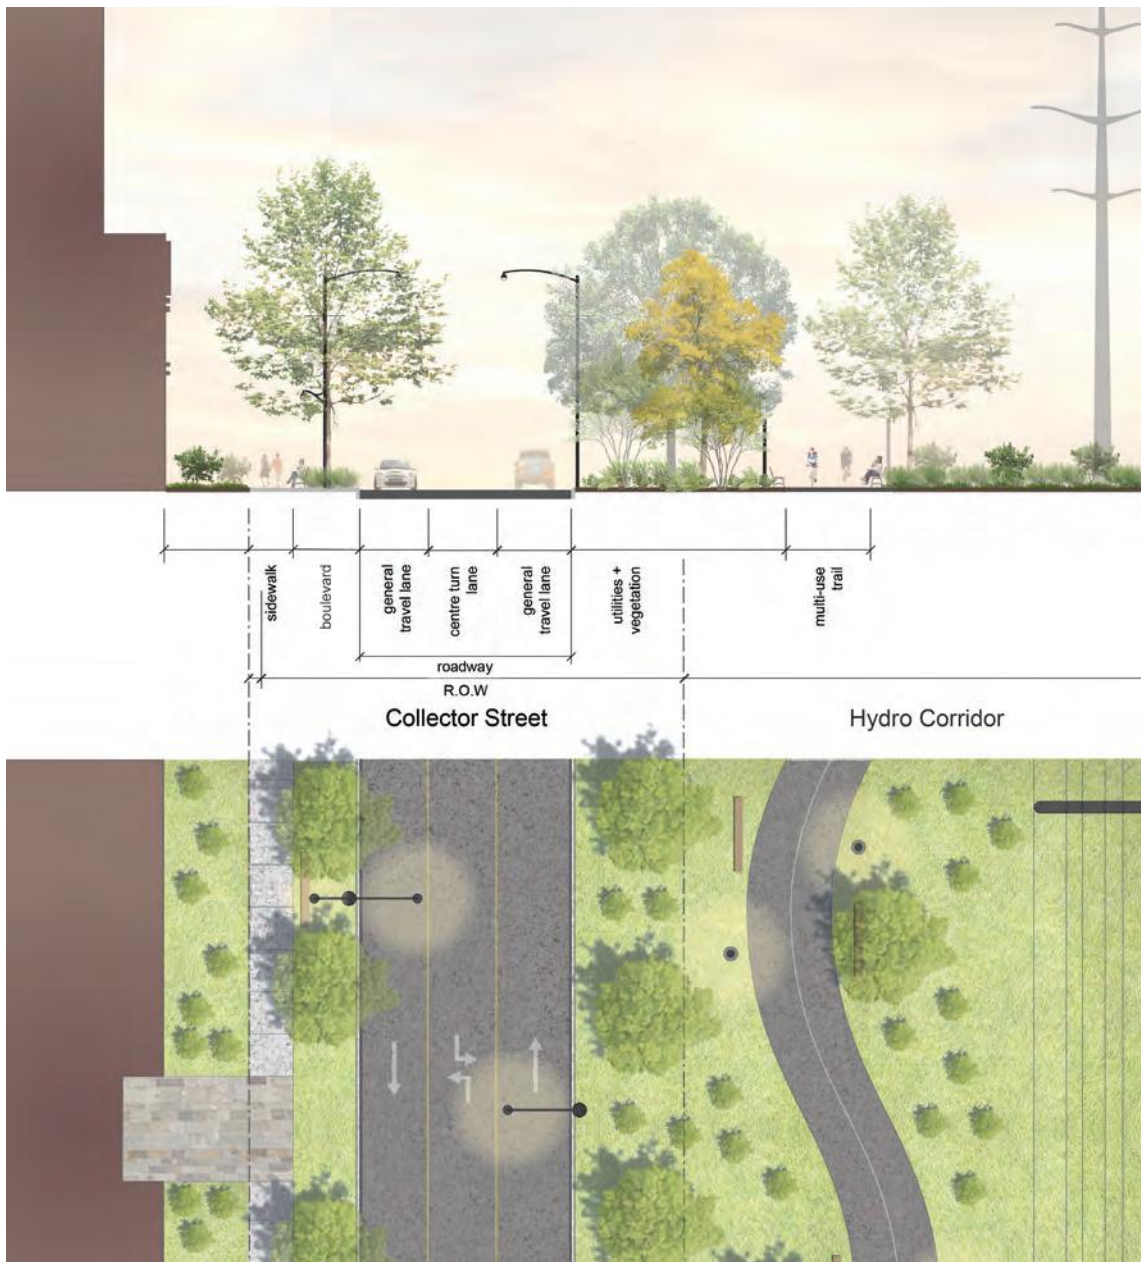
COLLECTOR STREET - BROMSGROVE ROAD FUTURE CONDITION
